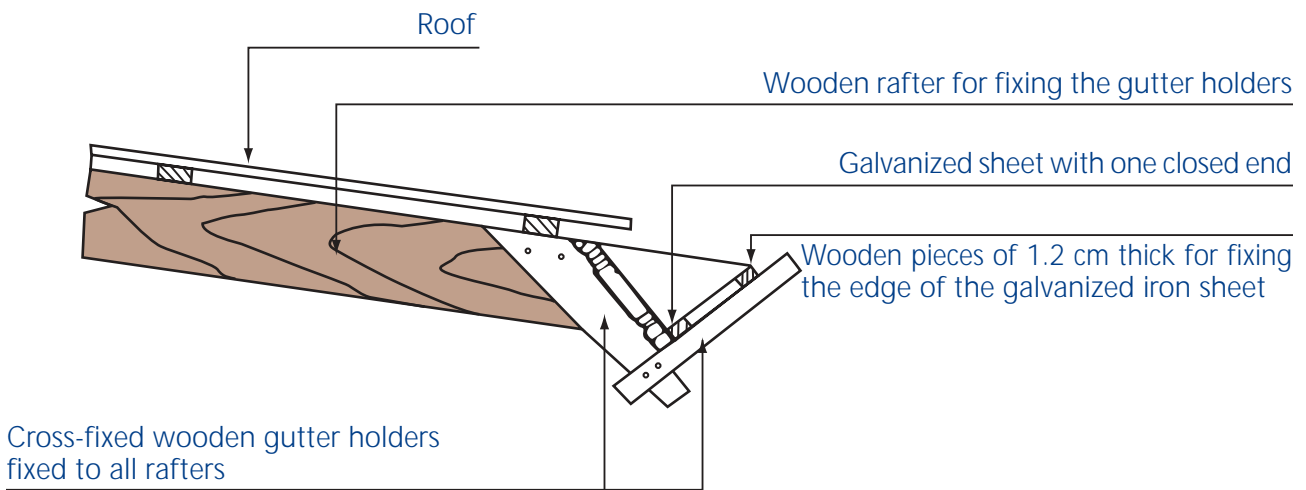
Fix the "V" shape galvanized iron sheet gutter to wooden structure using the wooden gutter holders.
